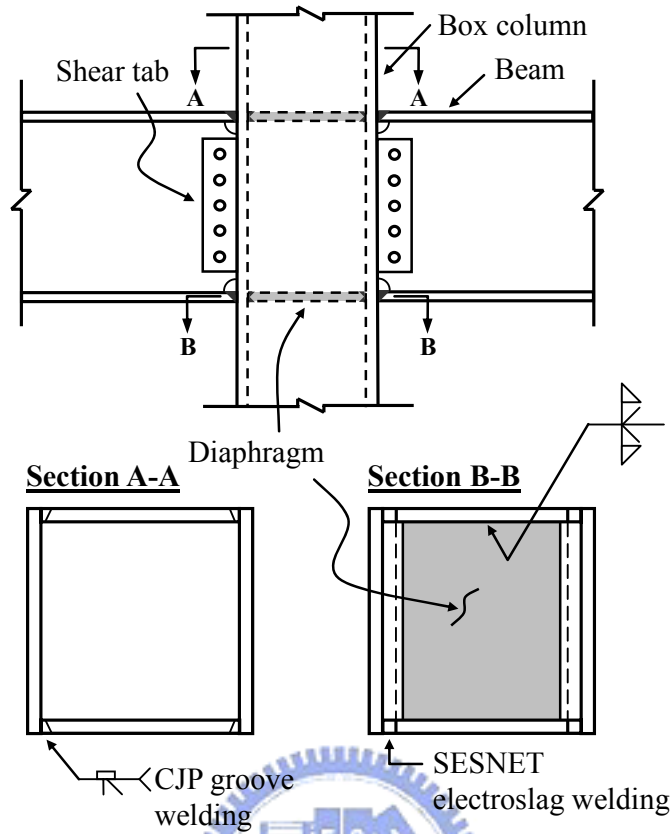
1 Connection details between H-shaped beam and welded built-up box column.
